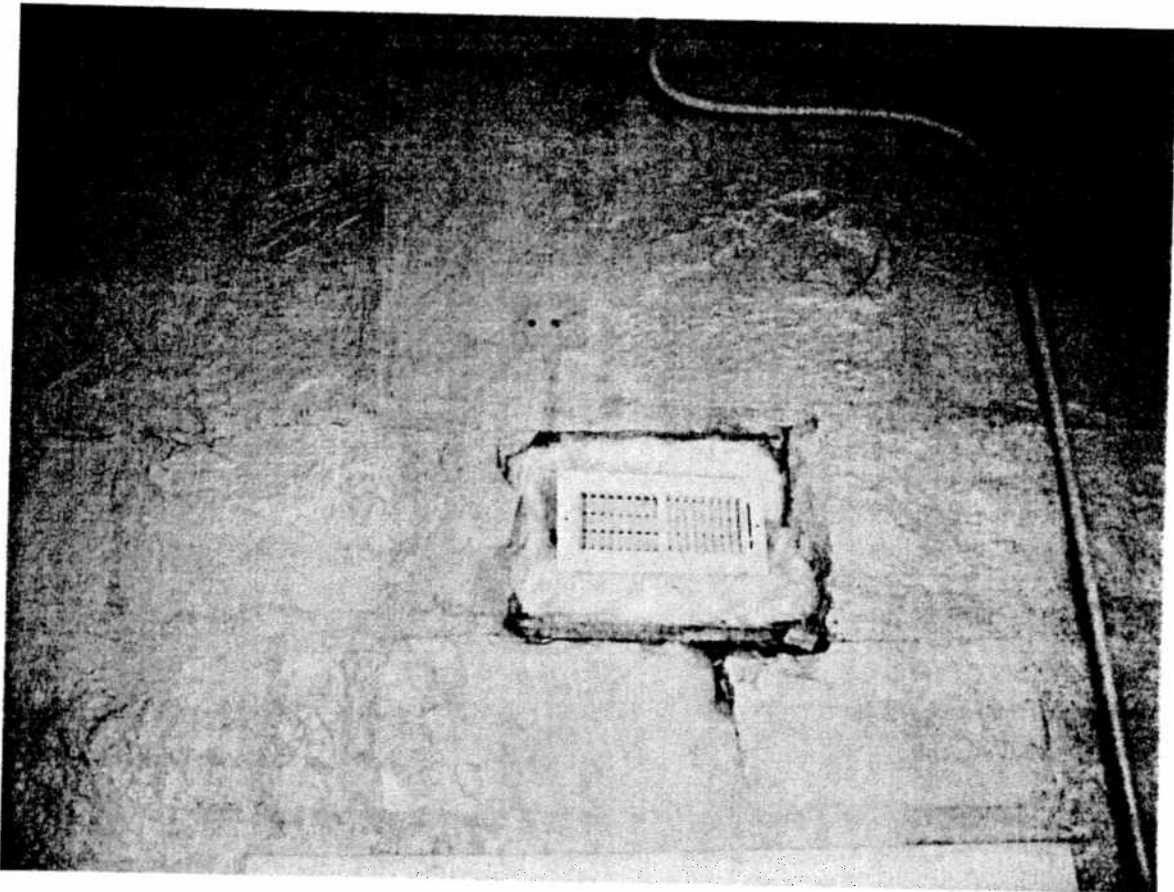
Hominy Armory – fire department office space and storage area in the north side of the building in the former mess hall area – note original green painted surface shows where an outlet was removed above the vent.
